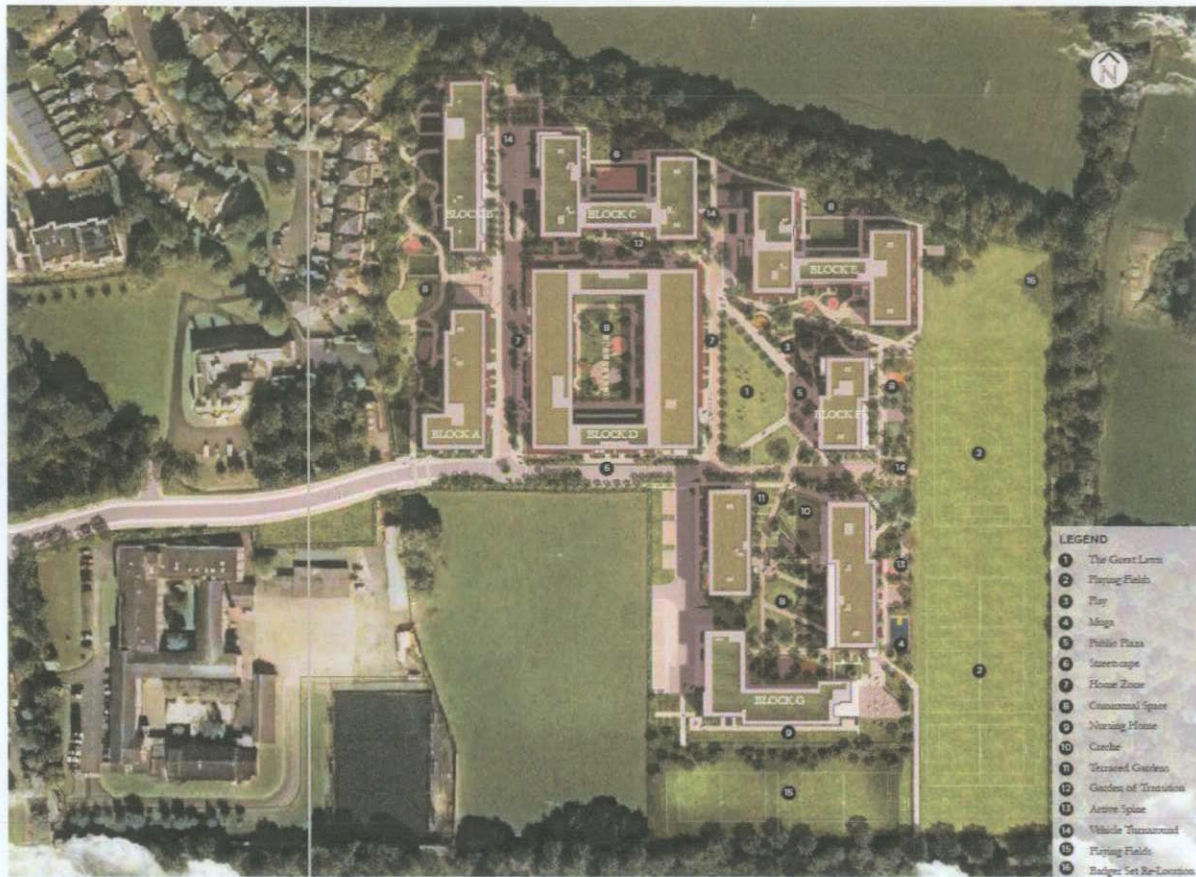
Proposed Site Layout (Adapted from NMP Landscape Design Statement – August 2022)
